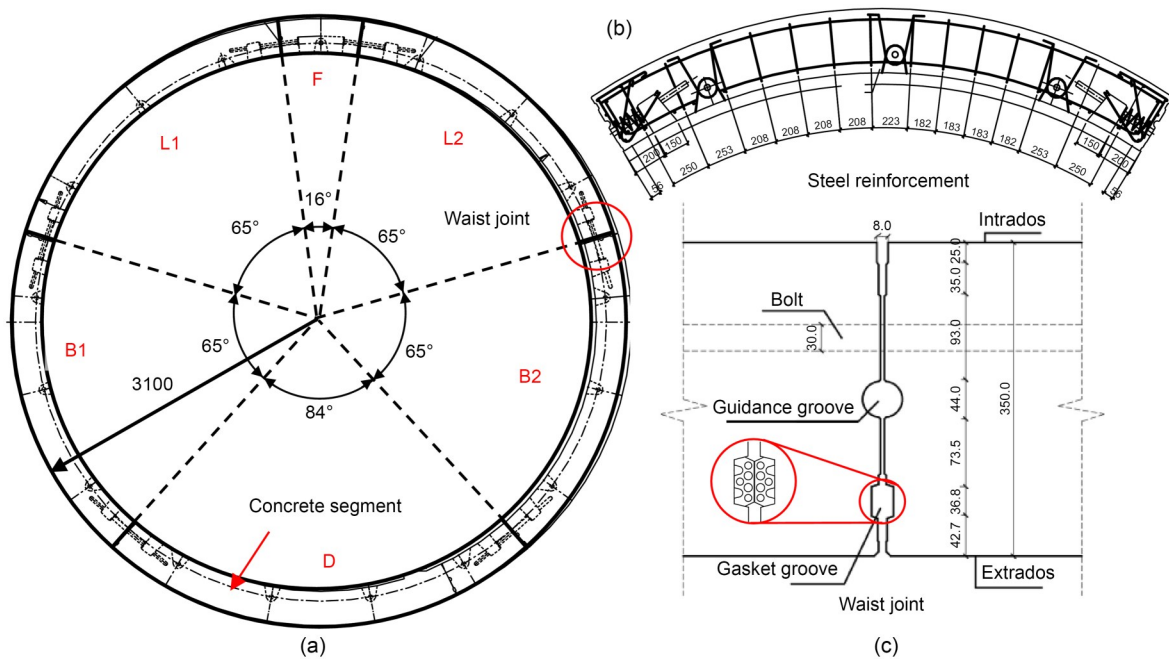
Prototype of the tunnel (unit: mm): (a) segmental lining; (b) steel reinforcement; (c) waist joint
